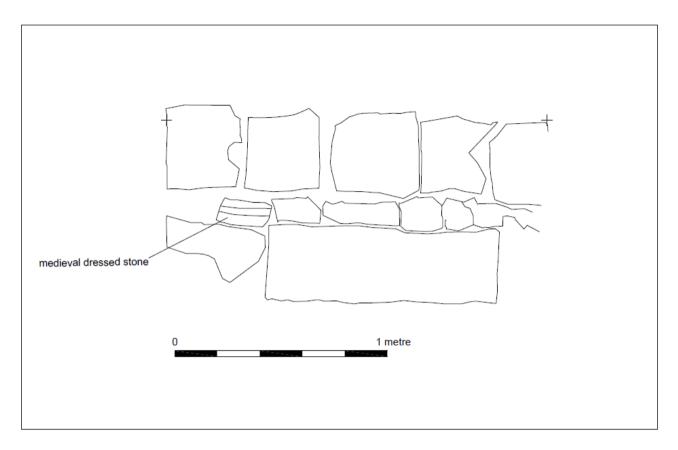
Section 2 - Detail of south-east facing section showing medieval dressed stone.
